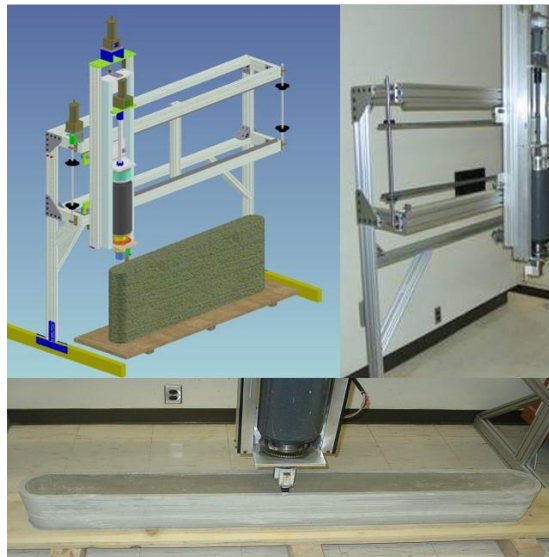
Example of a Robot Capable of Constructing a Wall: One Robot Builds the Wall and Covers its Exterior with Mortar or Concrete, Then It Can Also Fill the Interior Volume with Concrete.
